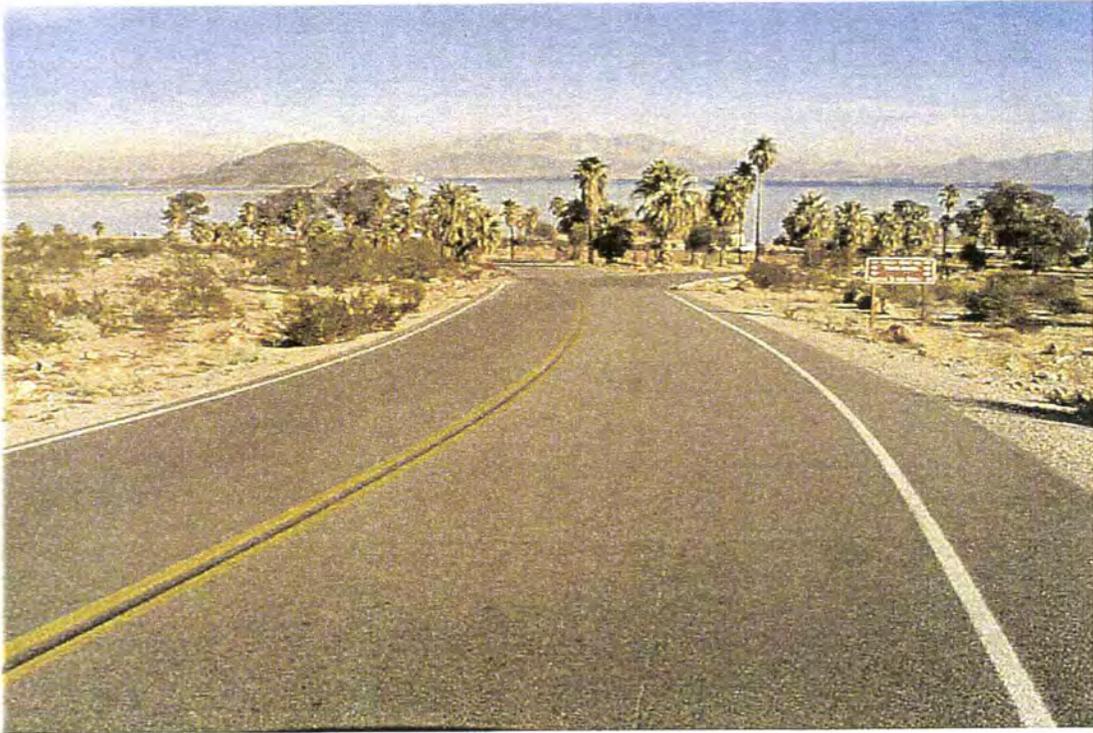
MP 0.00 - Begin at Rte 003, Typical Pavement Section
